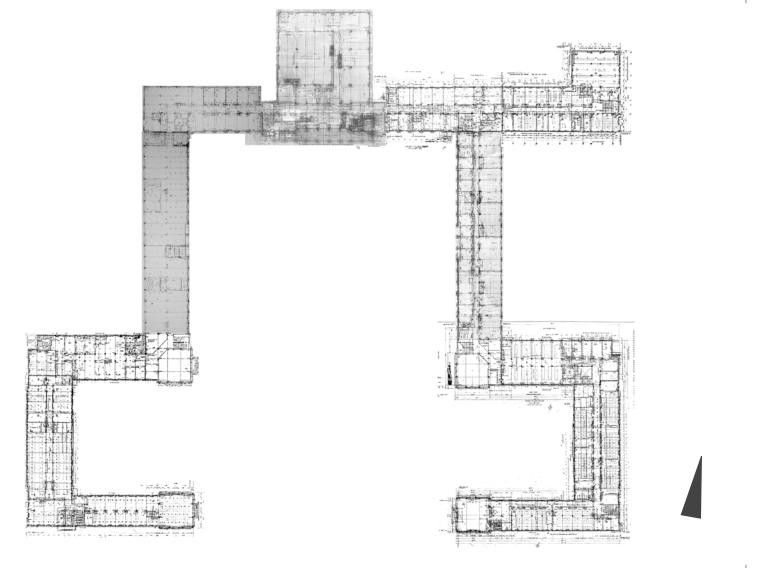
Floor Plan-Third Floor (Collage of separate drawings).
